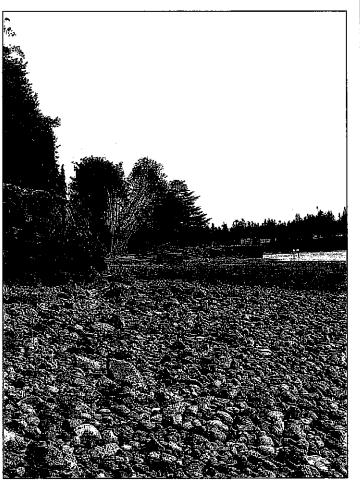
View west. Temporary construction access route from beach to gravel parking area.
